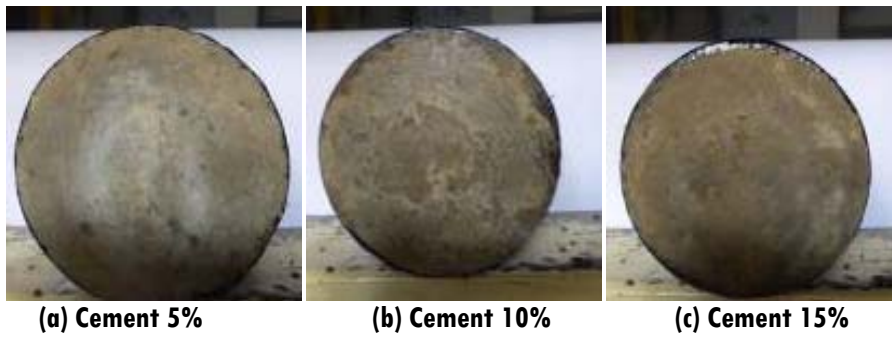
Specimens subjected 2 hours of spray erosion test (Raw soil, Moulding pressure 1.25MPa)
